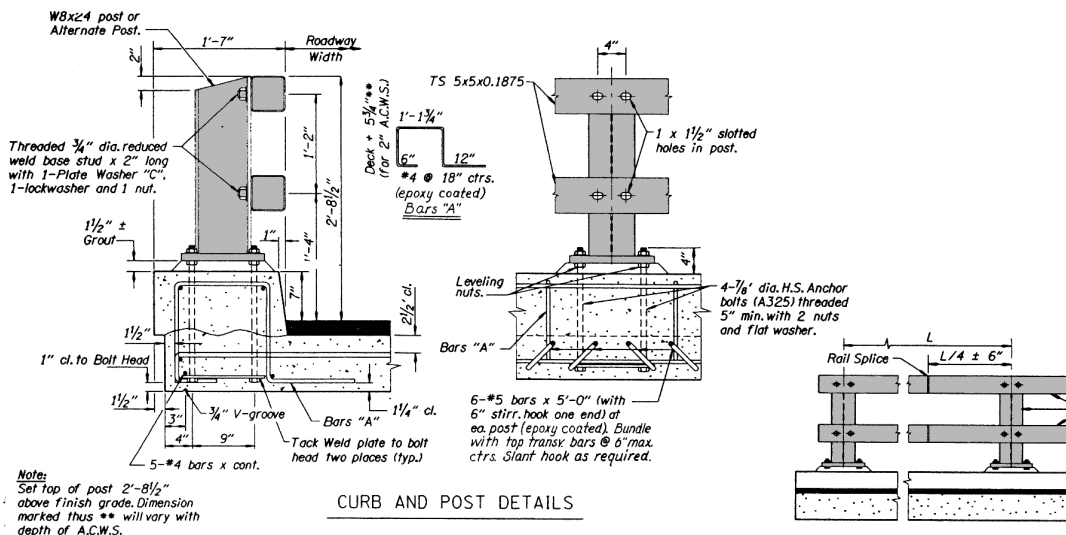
Standard 2-Tube Curb Mount Rail, Details
